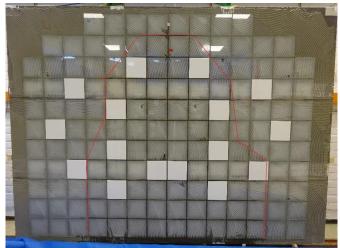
Wall #4 – Outer Moisture Perimeter Created by Saturated Grout
